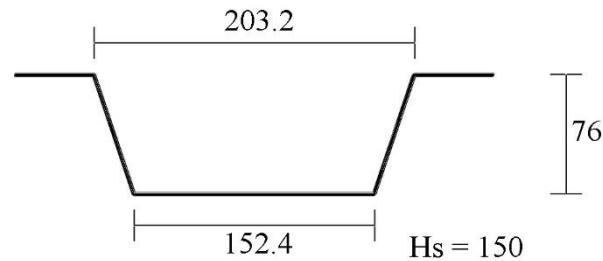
Details of the steel decking (All dimensions are in mm)
